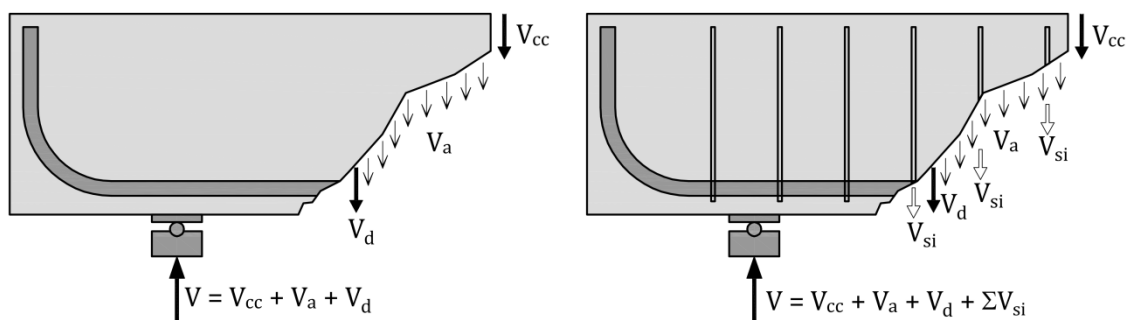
Forces at a diagonal crack in beams a) without shear reinforcement and b) with shear reinforcement
